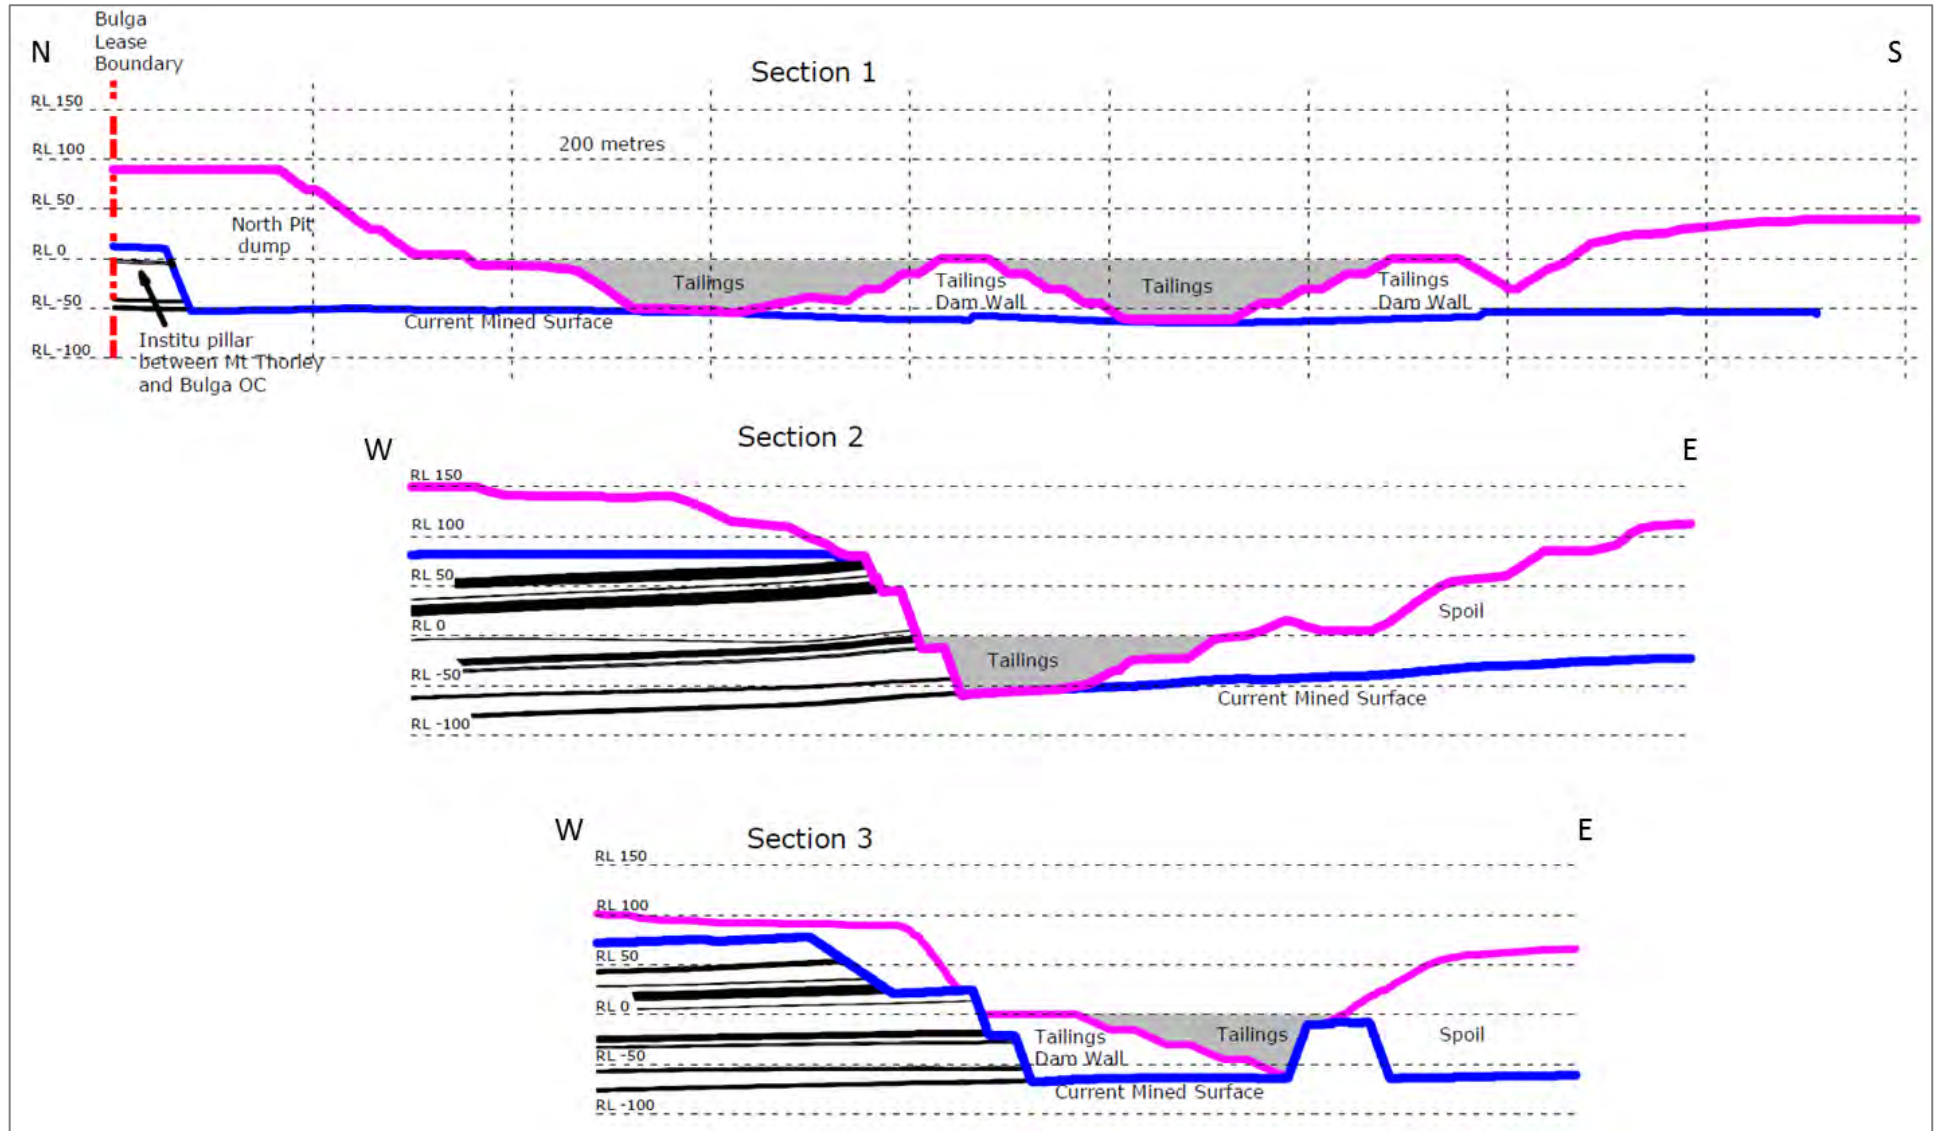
Sections through open cut mine showing proposed tailings emplacement (provided by BCM)
